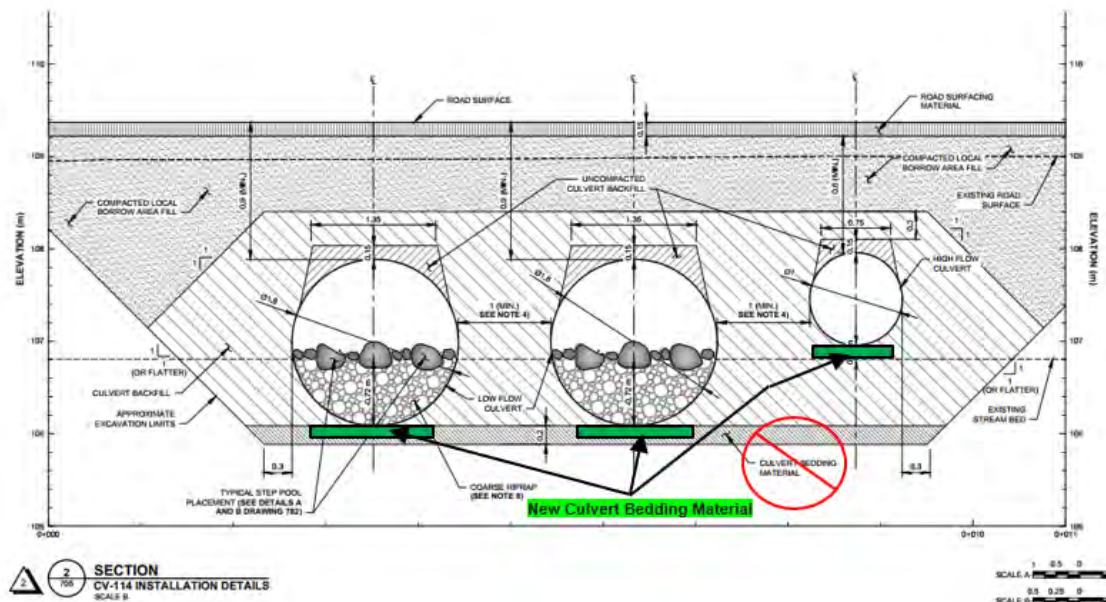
Example of Design Change Shown on Drawing No. 706 R2 CV-114
